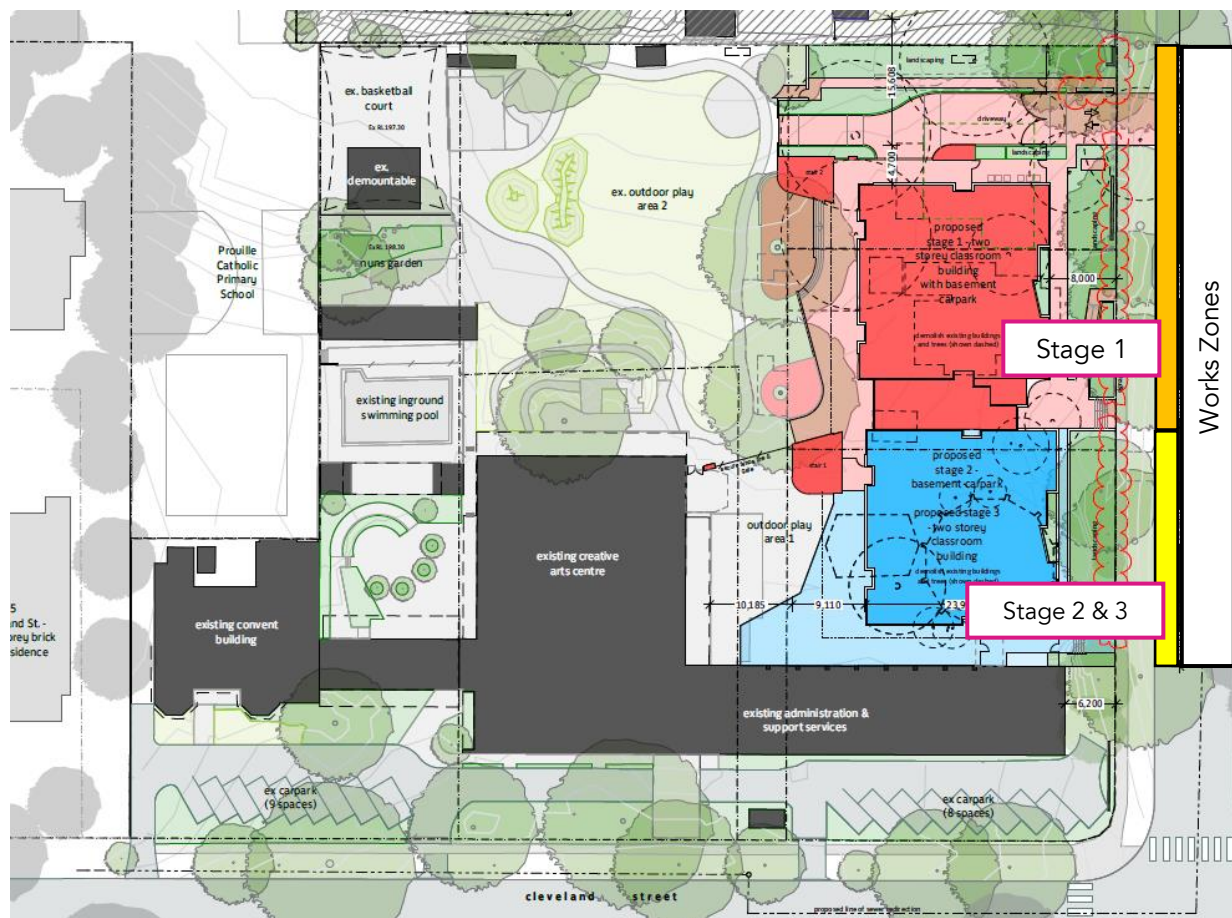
Preliminary Site Arrangement and Construction Access Driveways
